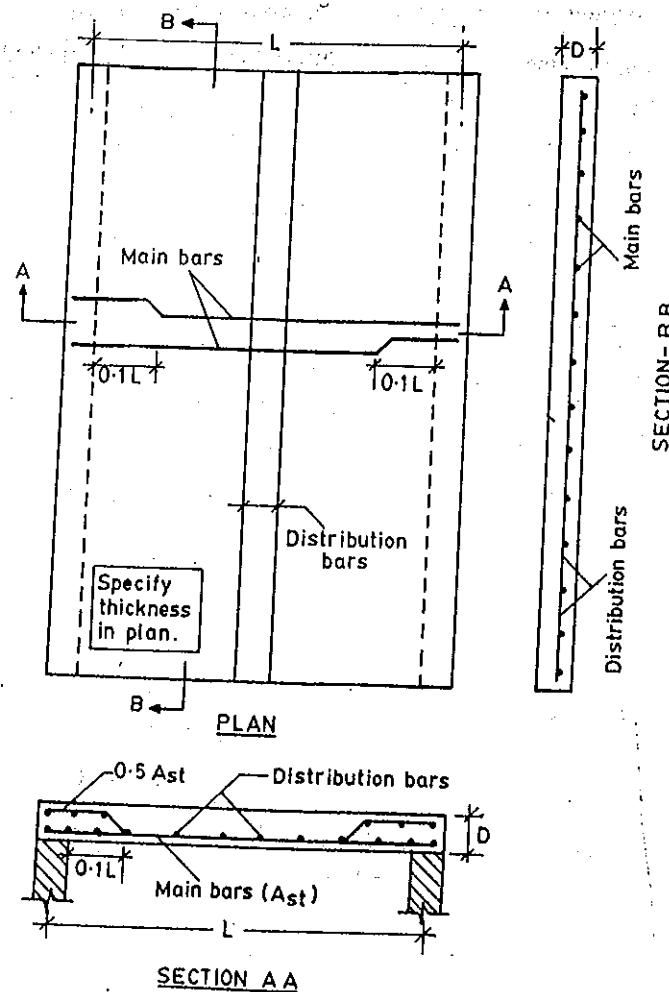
Typical Detailing in One Way Slab (SP-34)
